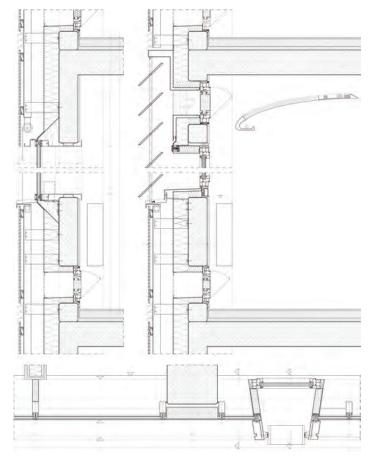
Air Traffic Control Center Langen, façade details (Source: Arup) 图2. 兰根空中交通管制中心幕墙详图(来源: Arup)
